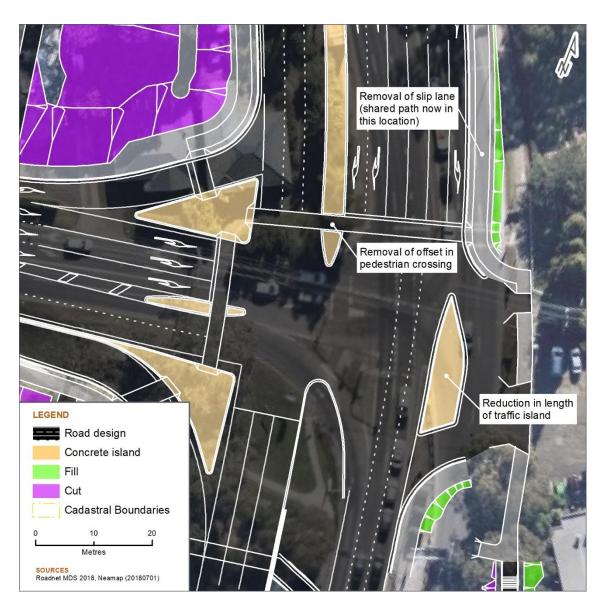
Revised design for the Princes Highway/Illaroo Road intersection
